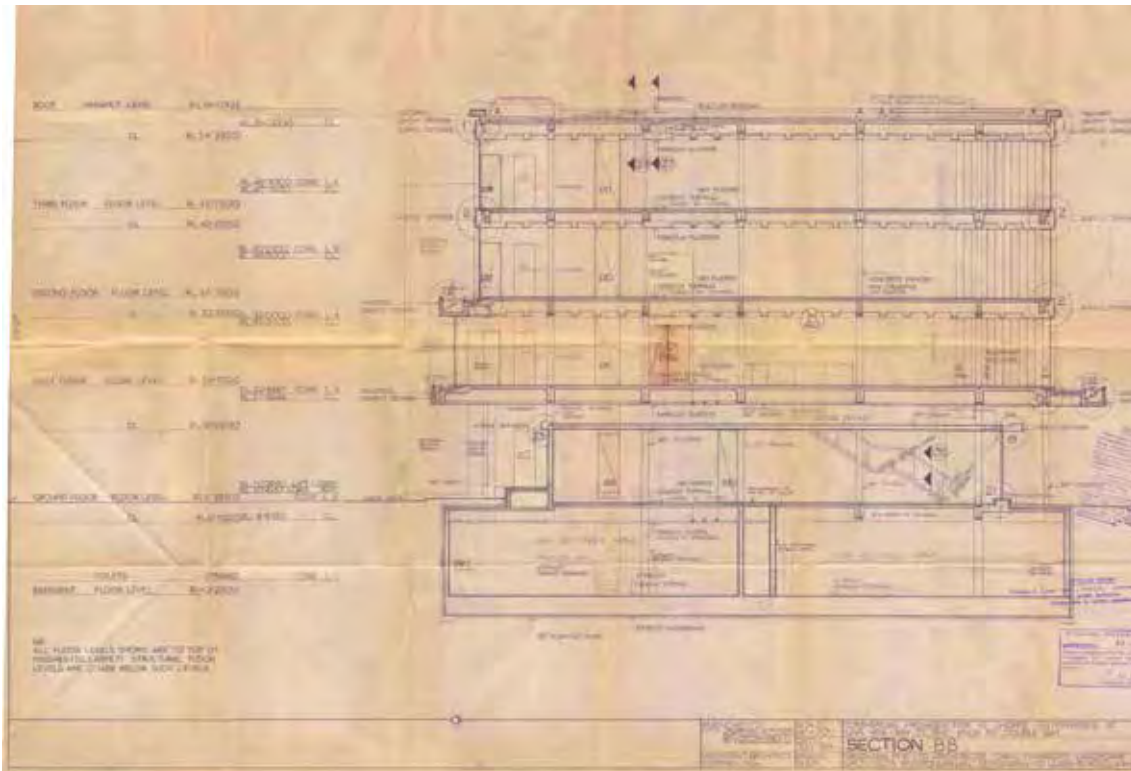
| Section BB of the Gruzman design. The third floor roof overhang was deleted. The moulded ceilings and the basement were also largely deleted. (Source: BA 1546/1971)
